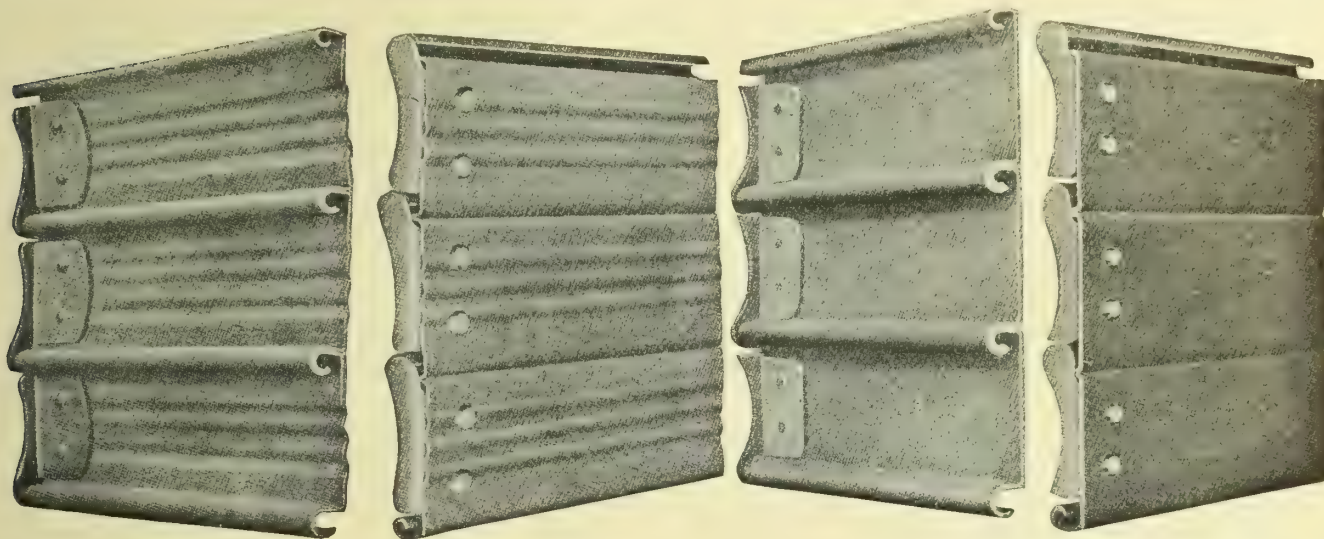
DETAILS OF STEEL ROLLING DOORS FOR ELEVATOR SHAFTS, ETC.
